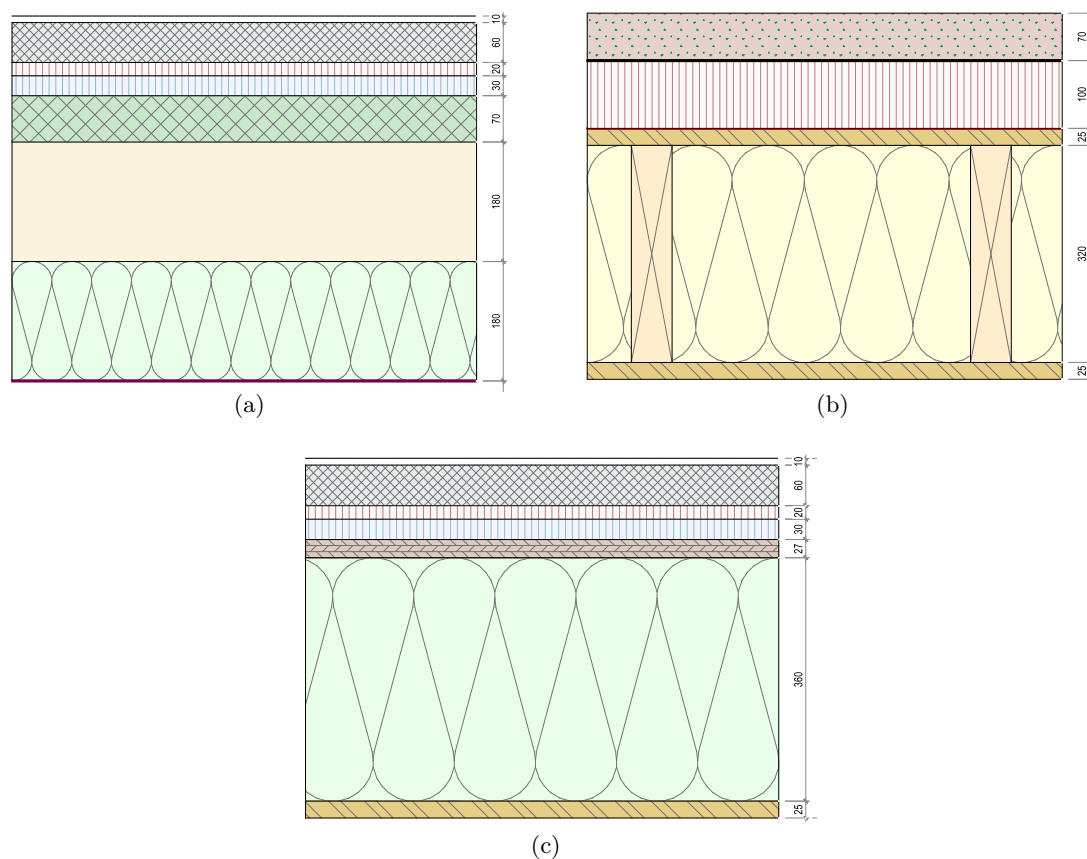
Timber ceiling structure with a concrete layer, typically used as a separation between two storeys in apartment houses, 6.24(a): Timber ceiling structure, typically used for roofs, 6.24(b): Timber ceiling structure, typically used for ground floors without the requirement for sufficient structure-borne sound insulation, 6.24(c)
